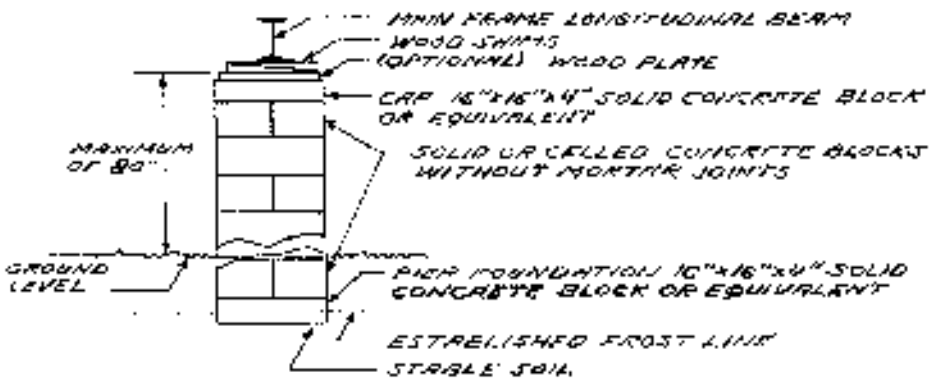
PIERS OVER 40" IN HEIGHT AND NOT EXCEEDING 80" IN HEIGHT (DOUBLE BLOCK CONSTRUCTION)
